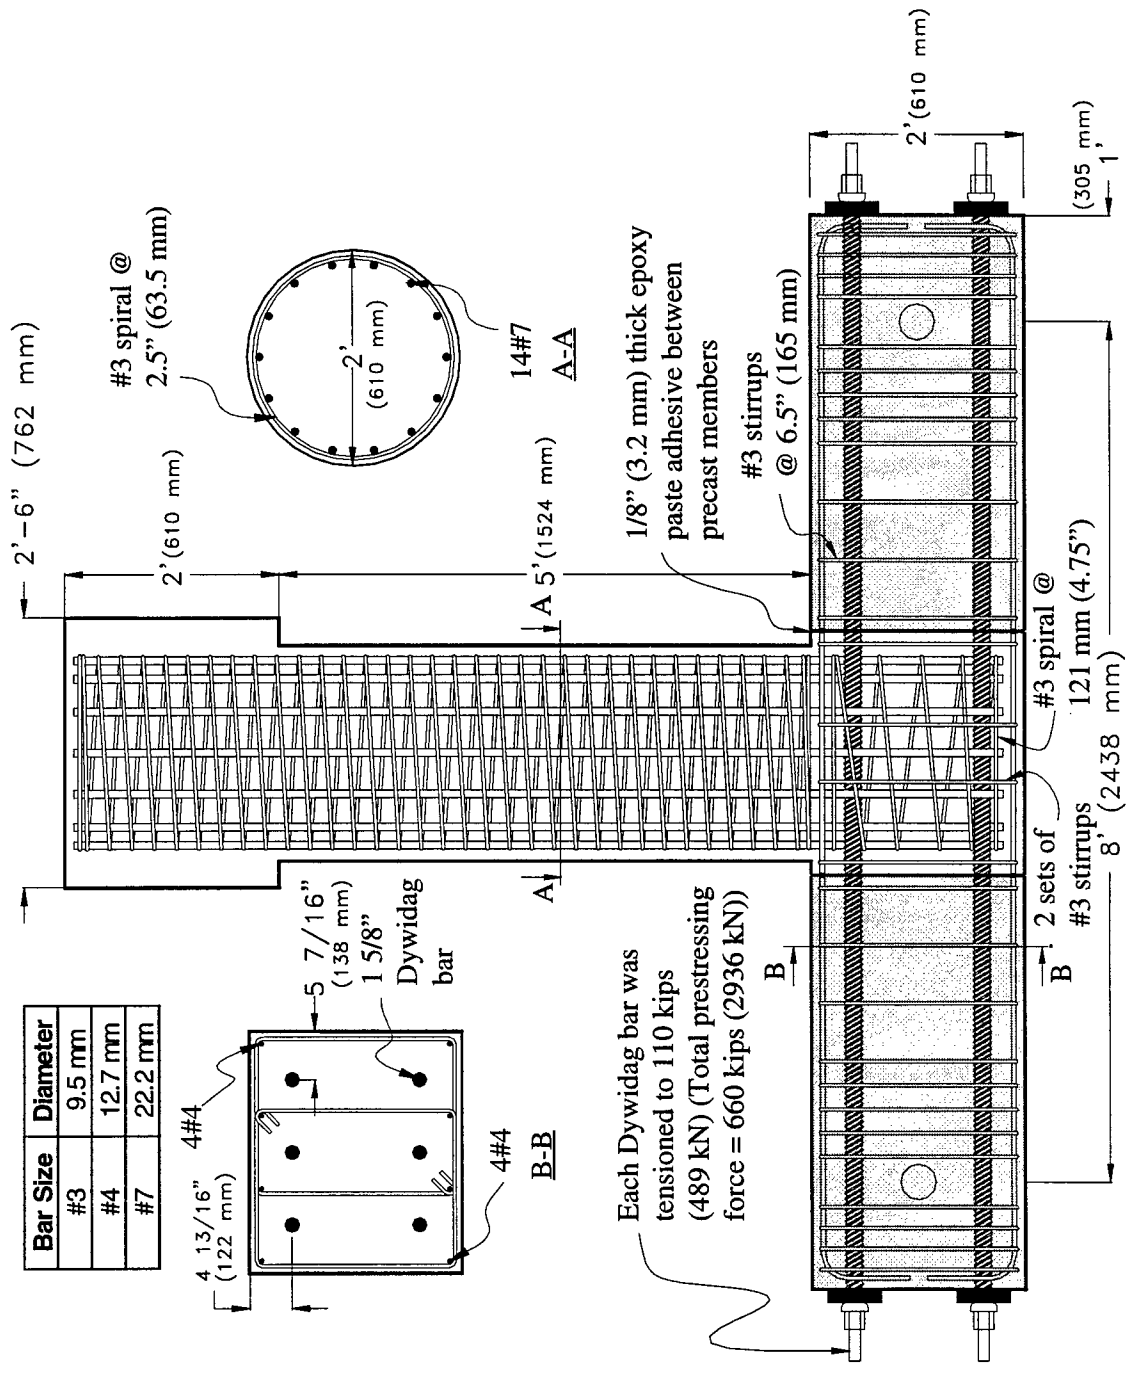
Key reinforcement details of the precast fully prestressed test unit IC3.
